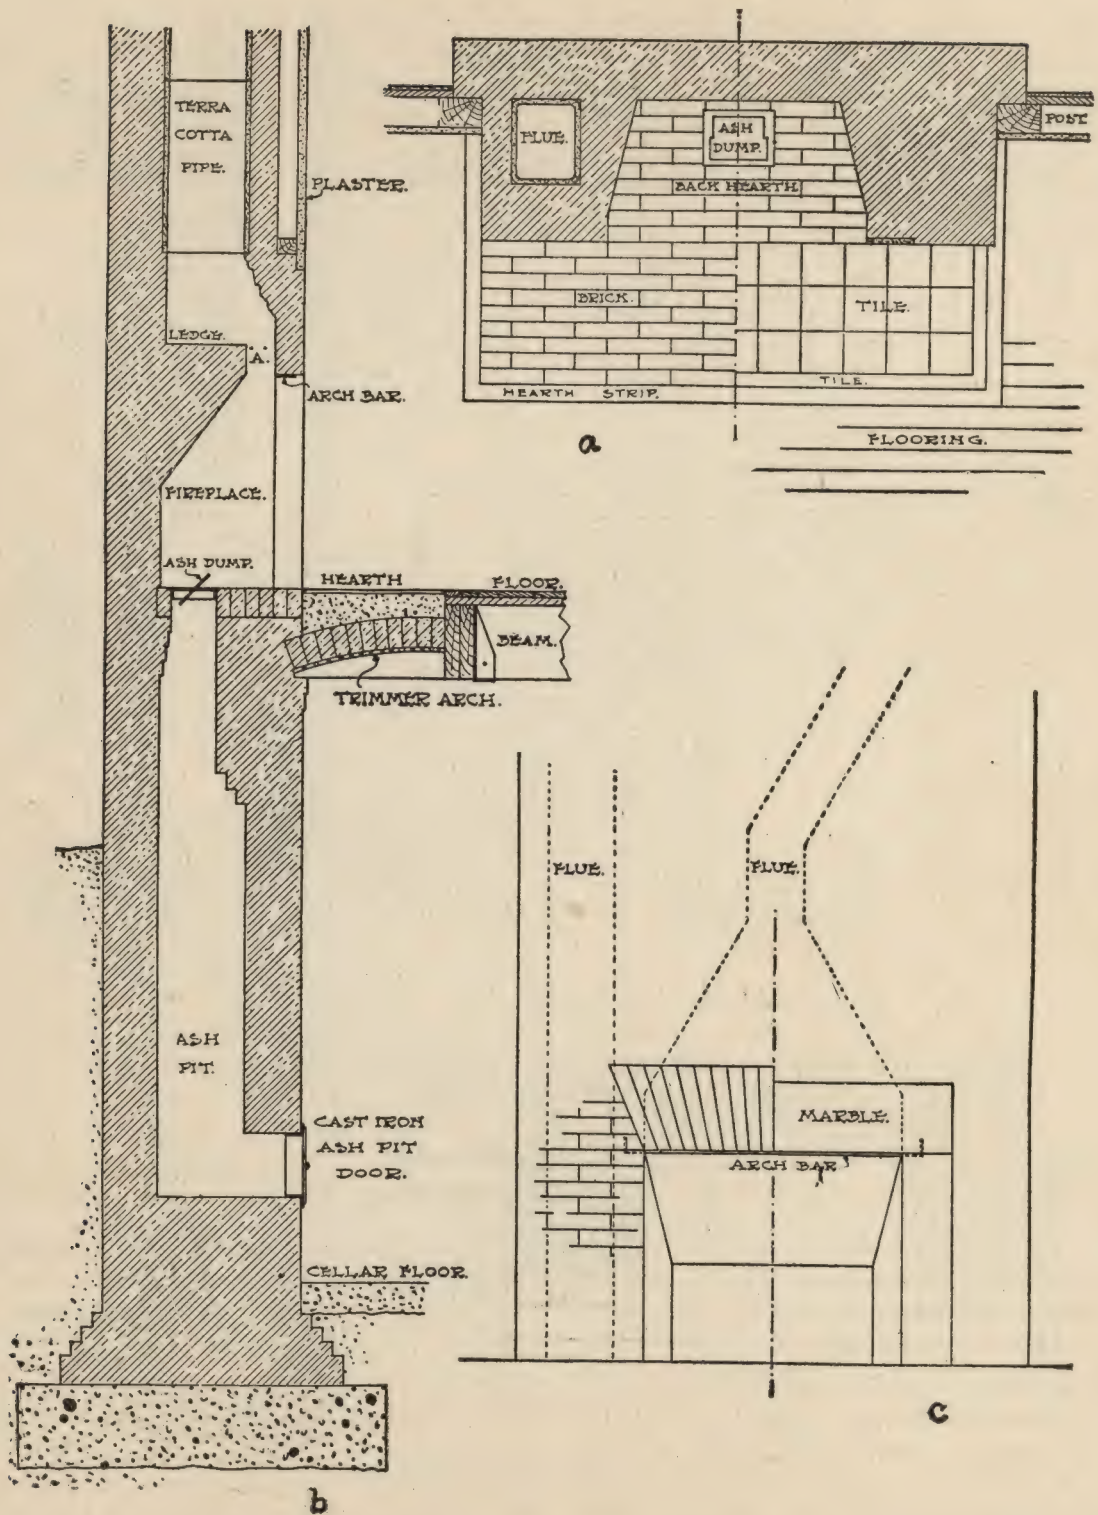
FIREPLACE CONSTRUCTION, NON-SMOKING.
